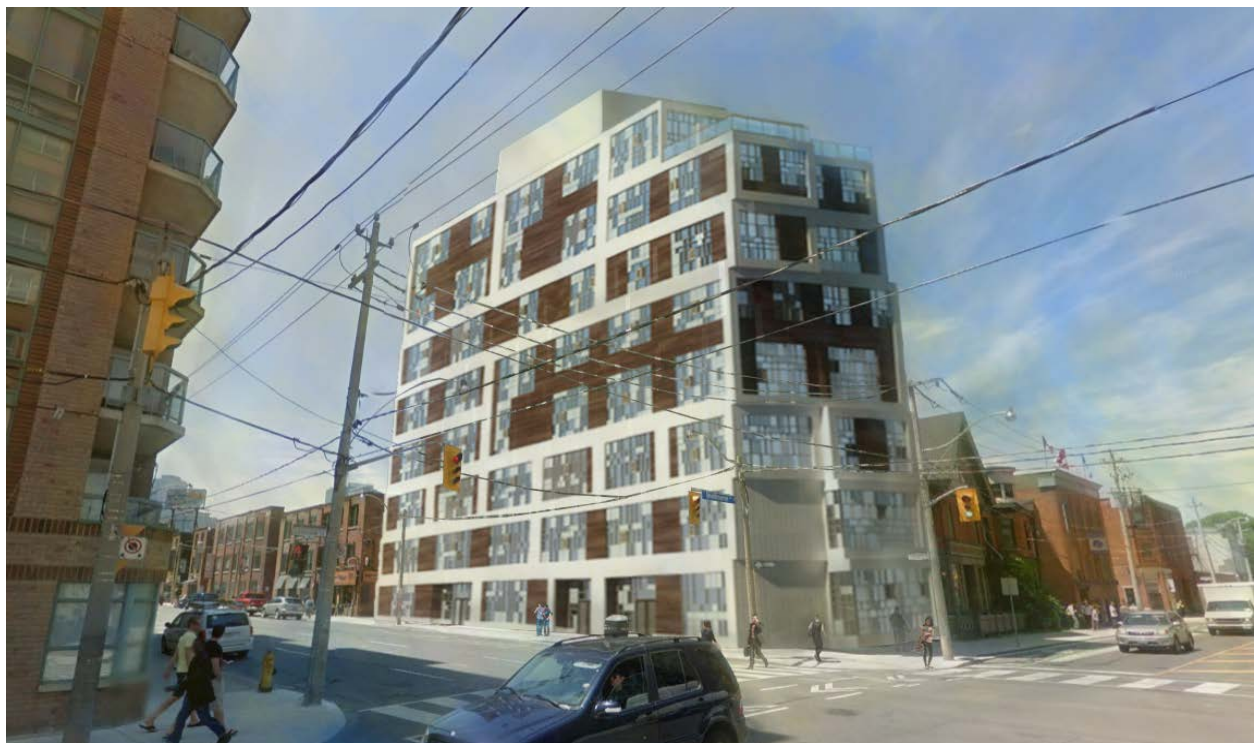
Exterior render, intersection of Sherbourne Street and Richmond Street view looking north-west
